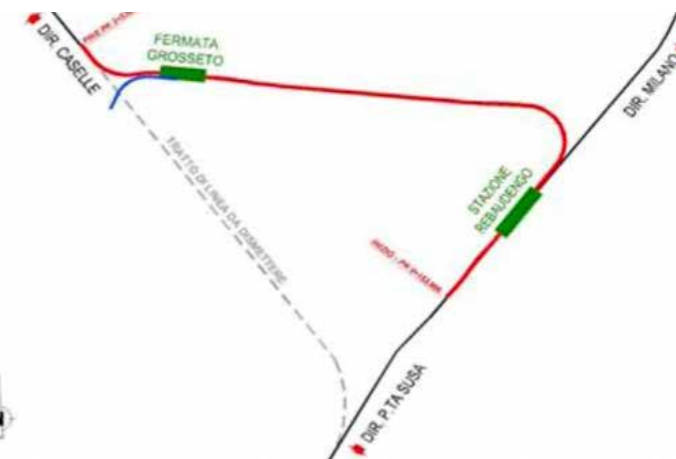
Plan sketch of the new railway link (red line) / Schema planimetrico del nuovo collegamento ferroviario (linea rossa).
